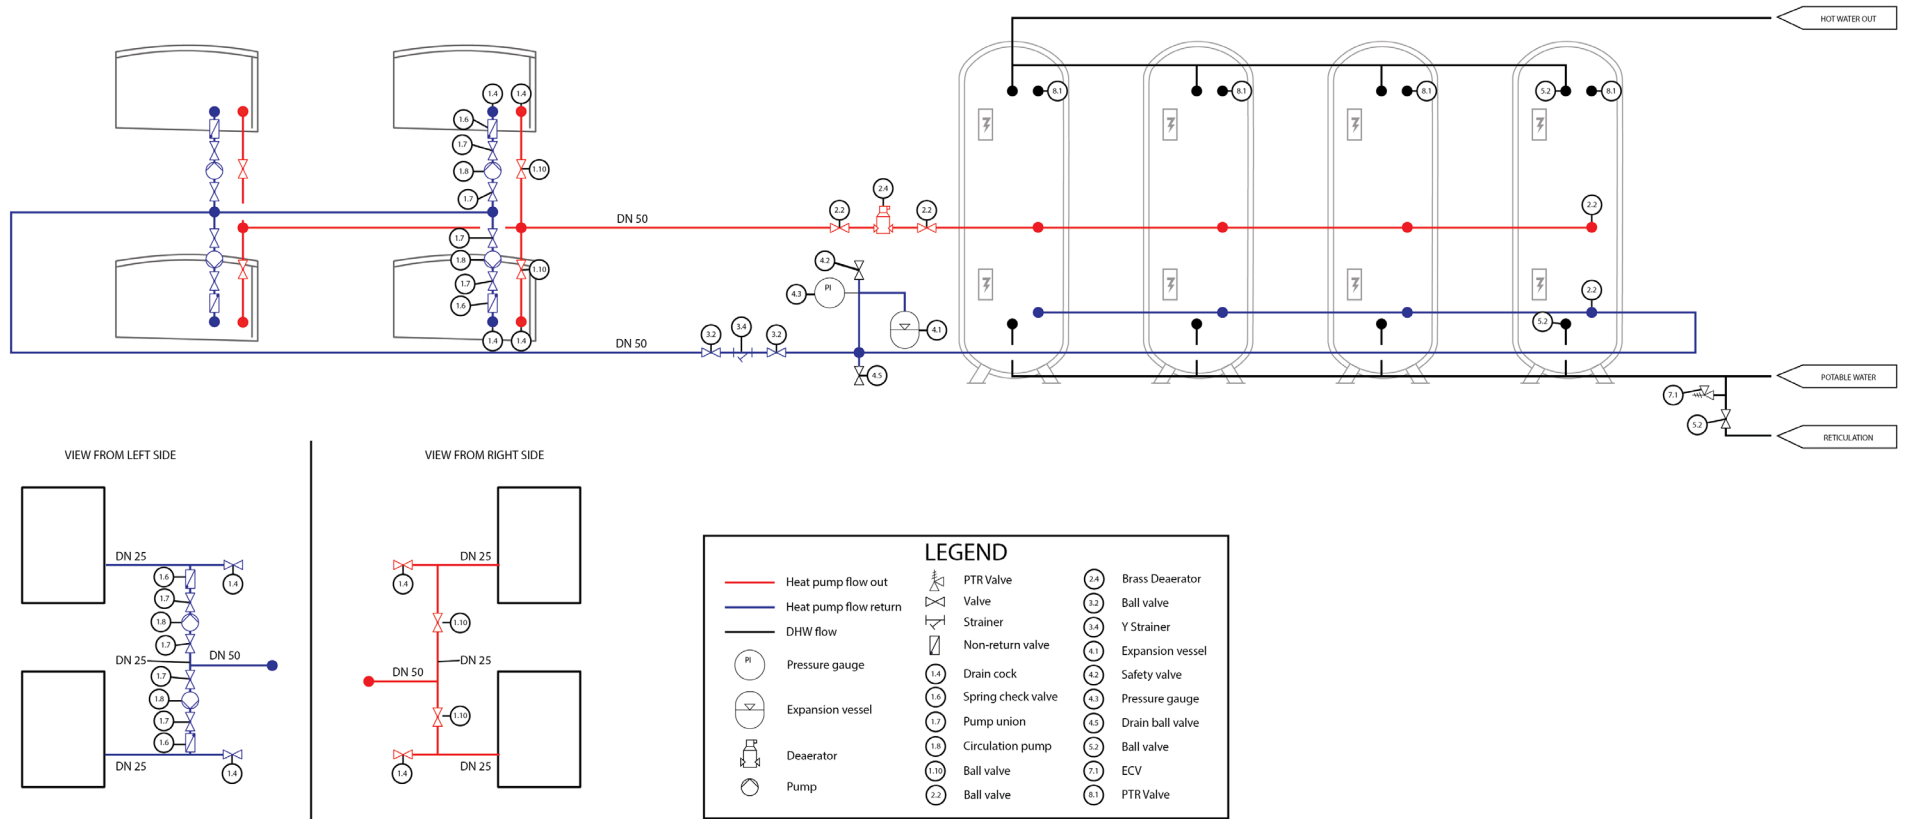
Hydraulic installation layout using 4 heat pumps and 4 tanks. Note the same plumbing principle applies regardless of the number of heat pumps and tanks (one heat pump to one tank relationship will always be maintained).
